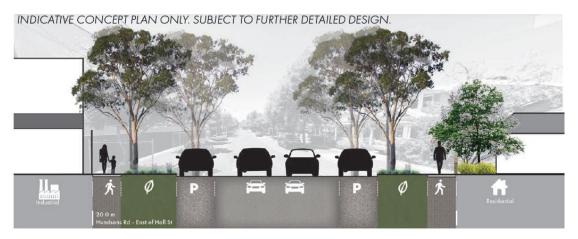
Proposed cross section for Hudsons Road East from *Draft Spotswood Activity Centre Structure Plan, March 2022
